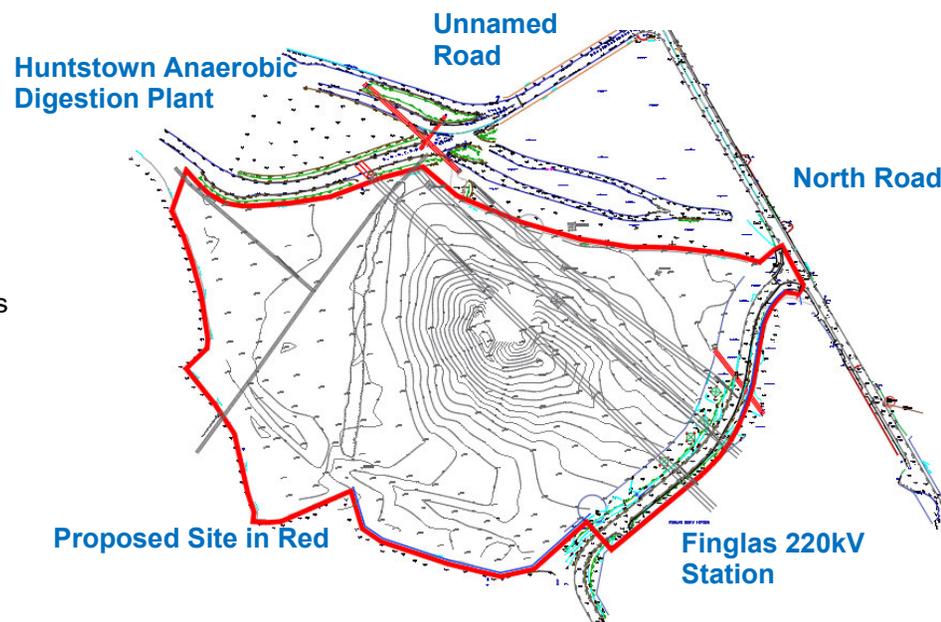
EXISTING SITE PLAN, WITH PROPOSED SITE OUTLINED IN RED
